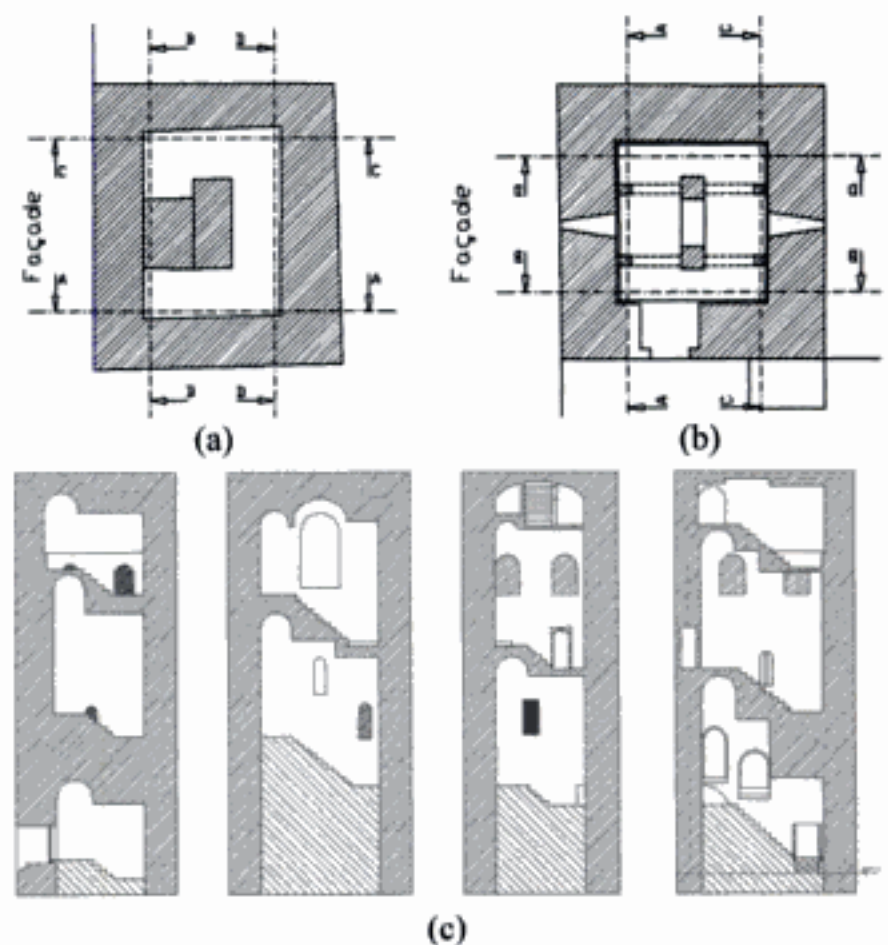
Partial sections of the towers: (a) horizontal section of the South tower, (b) horizontal section of the North tower and (c) sections A–D for the South tower.
